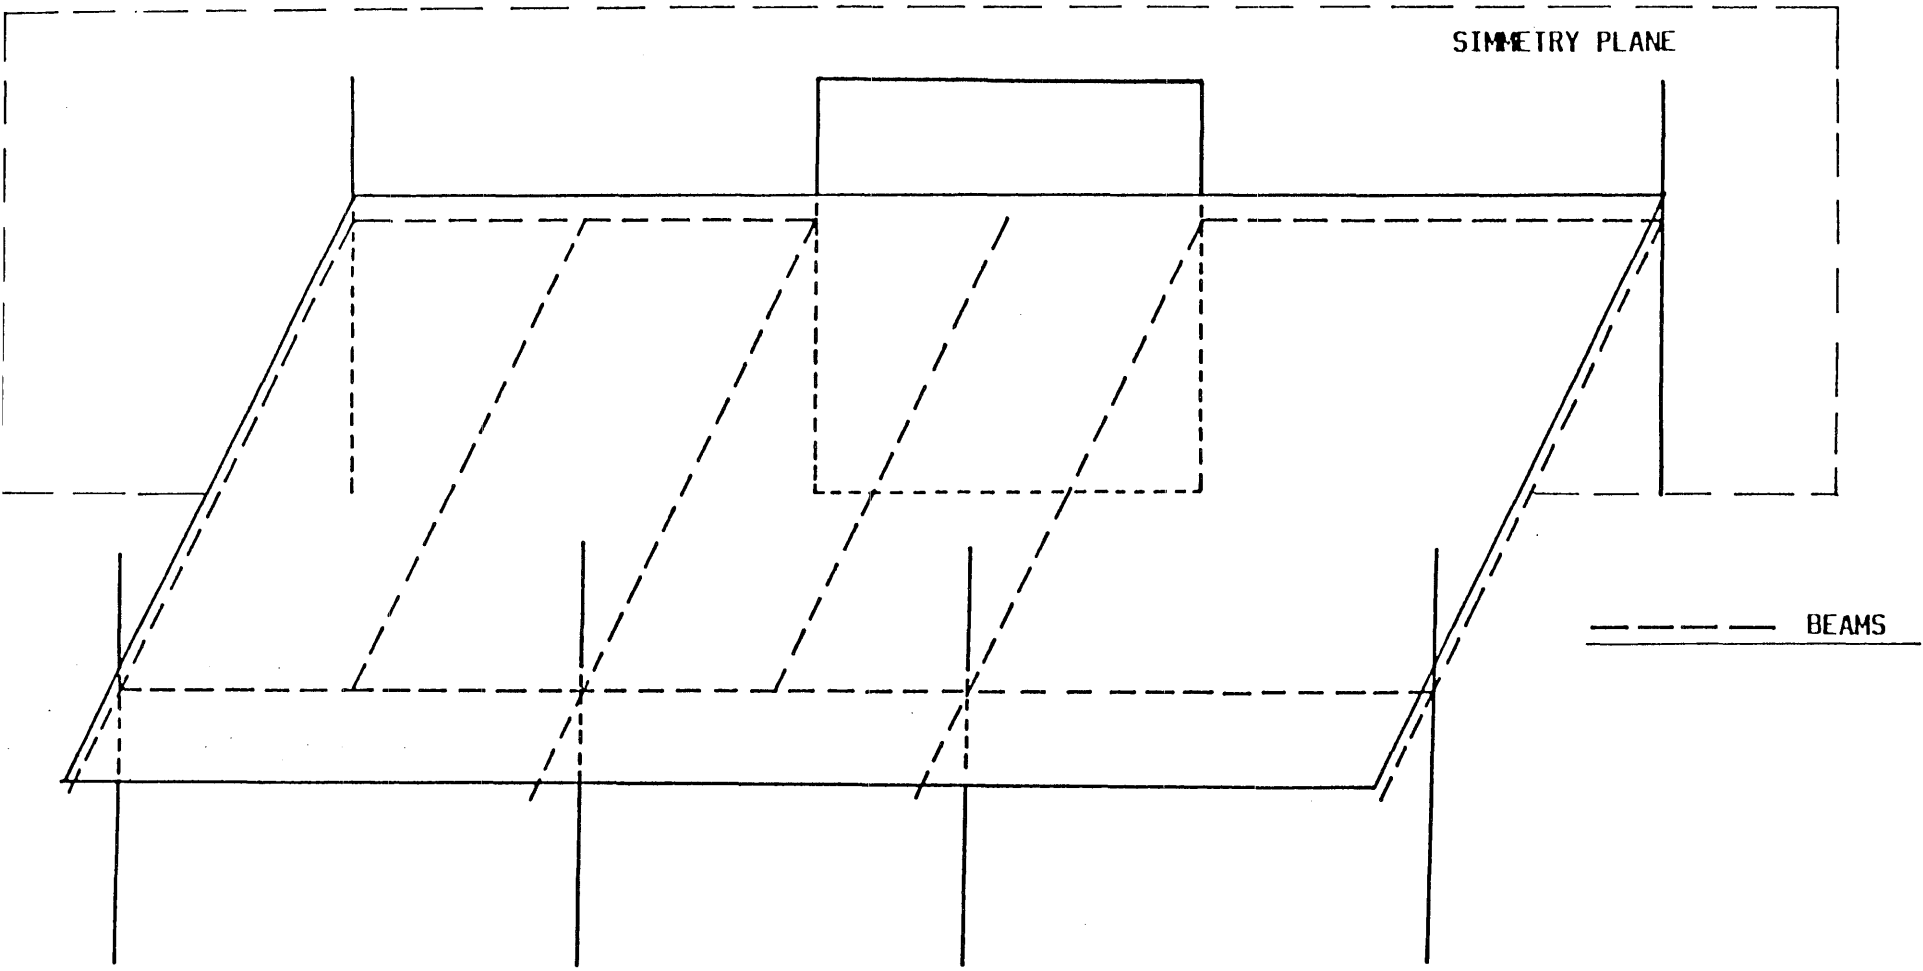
Test specimen: a schematic view of the portion of the building included in the numerical model
